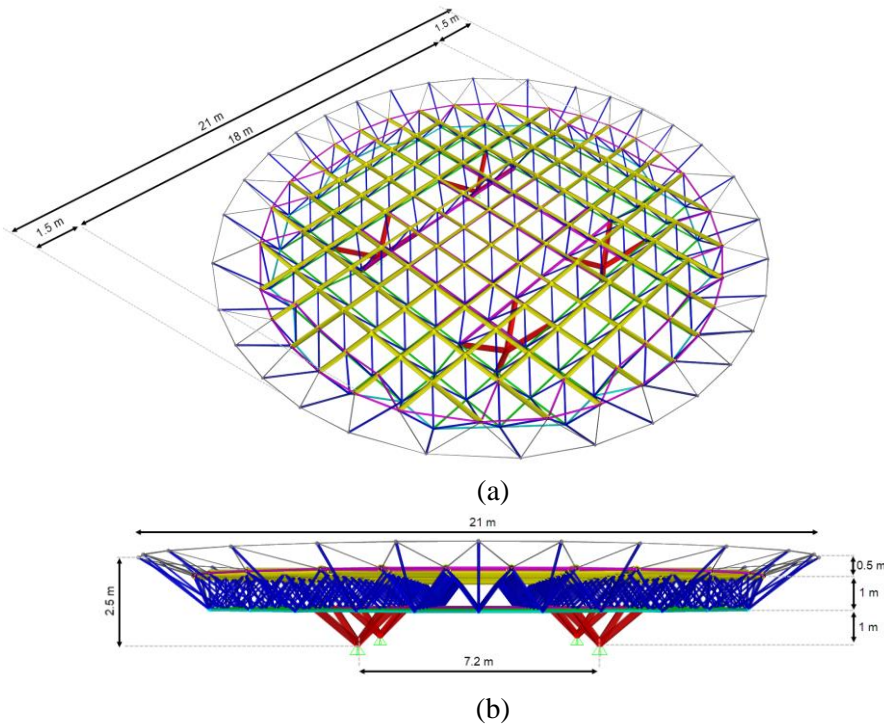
1104-bar helipad truss: a) 3D view, b) Side view
